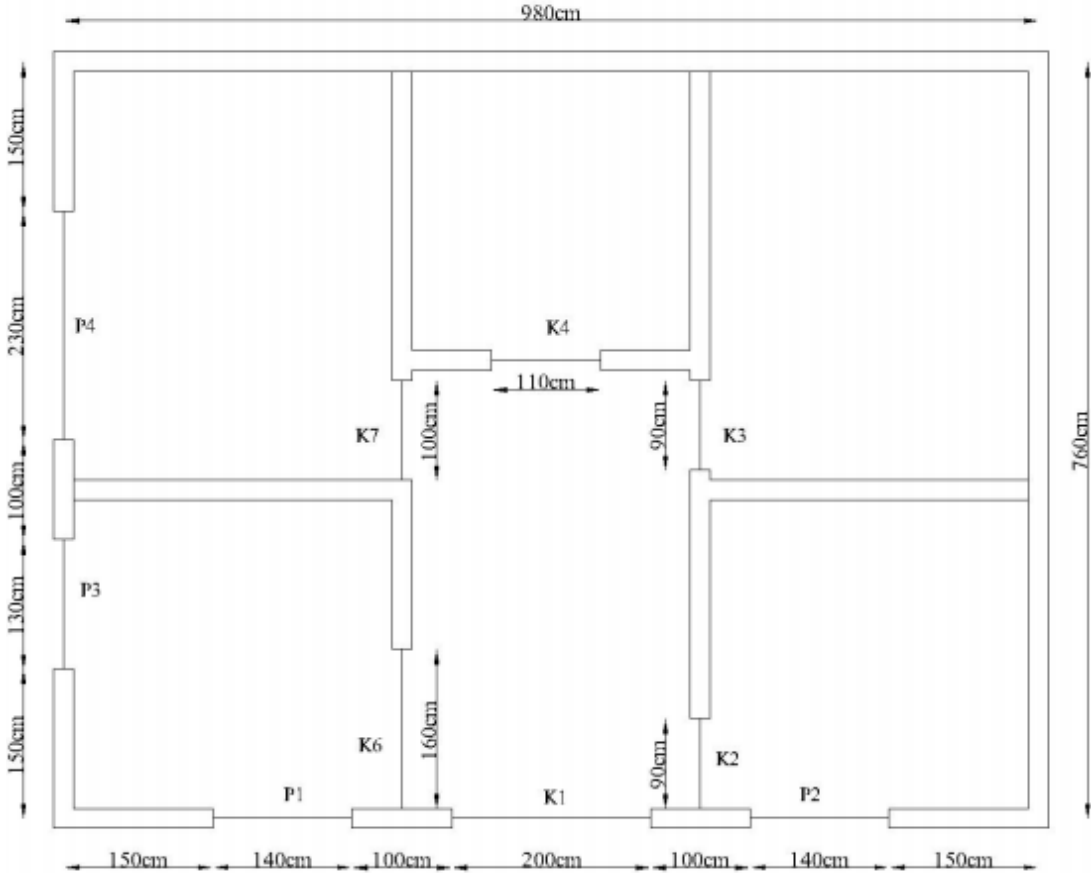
1. Plan geometry of subclass R2W1 of masonry building model
